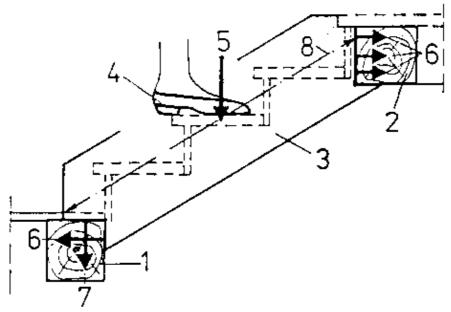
Distribution of forces in the bottom and top landings – 1 lower stair–apron, 2 upper stair–apron, 3 stair string, 4 load on the stairs by user, 5 acting force by user, 6 force acting horizontally, 7 force acting vertically, 8 force acting diagonally between the two landings
